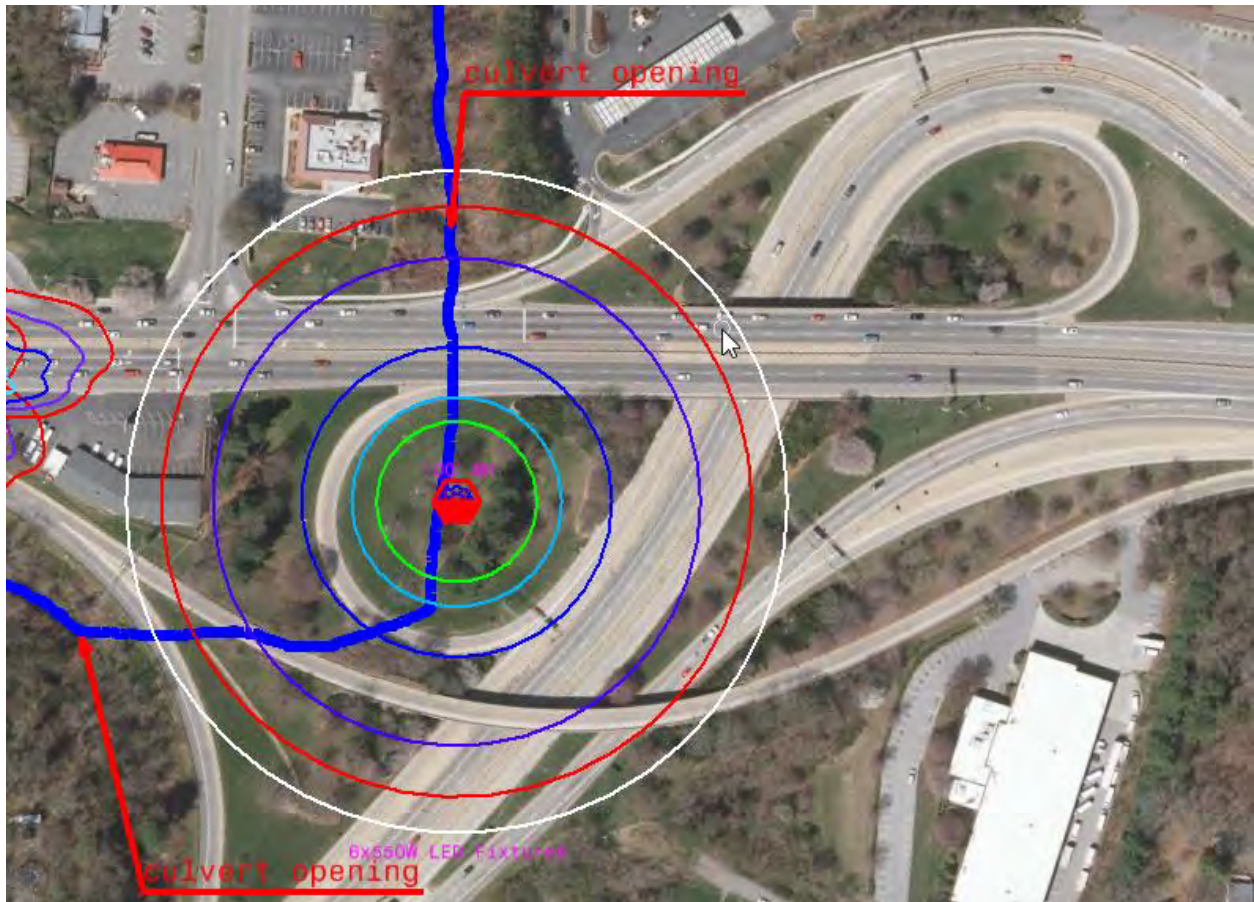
Existing lighting layout at Smith Mill Creek culvert at I-26/Patton Avenue Interchange.
